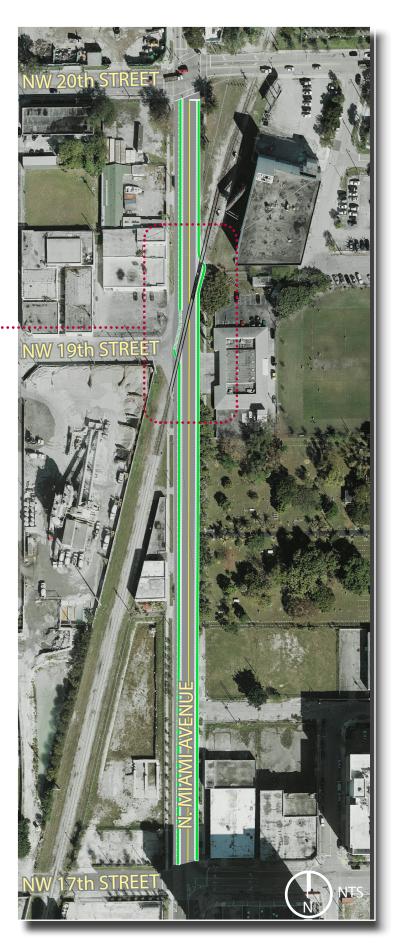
Road Diet and Railroad Crossing N Miami Avenue from N 20th Street to N 17th Street Miami, Florida | USA
